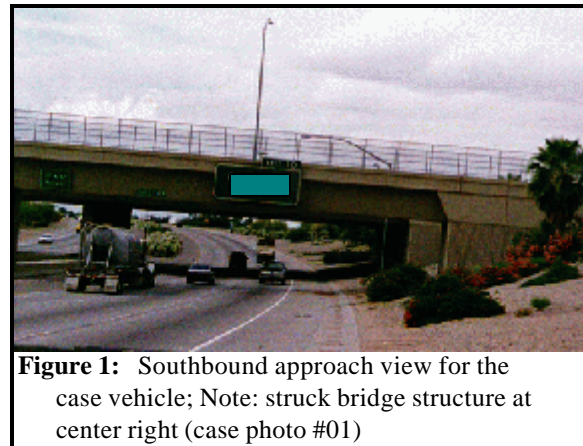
Southbound approach view for the case vehicle; Note: struck bridge structure at center right (case photo #01)
